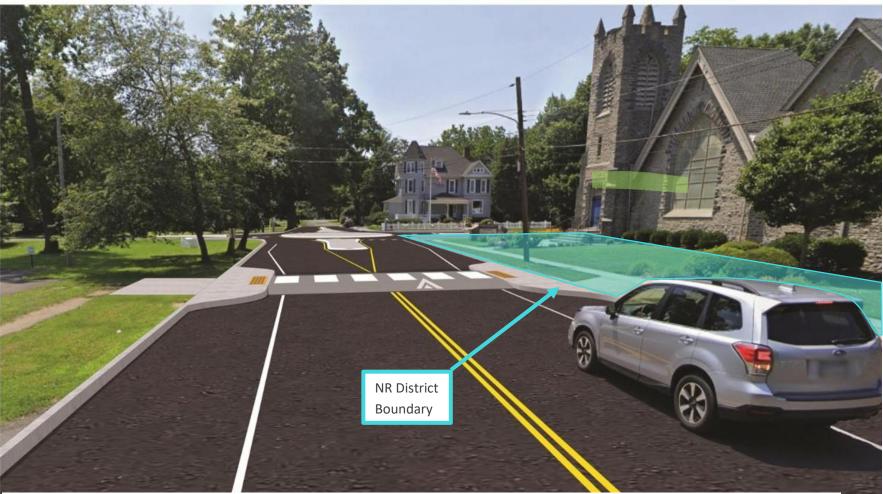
Gillam Avenue Improvements (Rendering), showing the proposed mini-roundabout at Bellevue Avene and Gillam Avenue, raised crosswalk, and curb bulb-outs. The Langhorne Historic District National Register boundary (blue shading) runs along the north side of Gillam Avenue and includes the historic core of the church to the right. The district boundary follows the east side of Bellevue Avenue north, and excludes the house shown at the corner (378 Bellevue Avenue).
